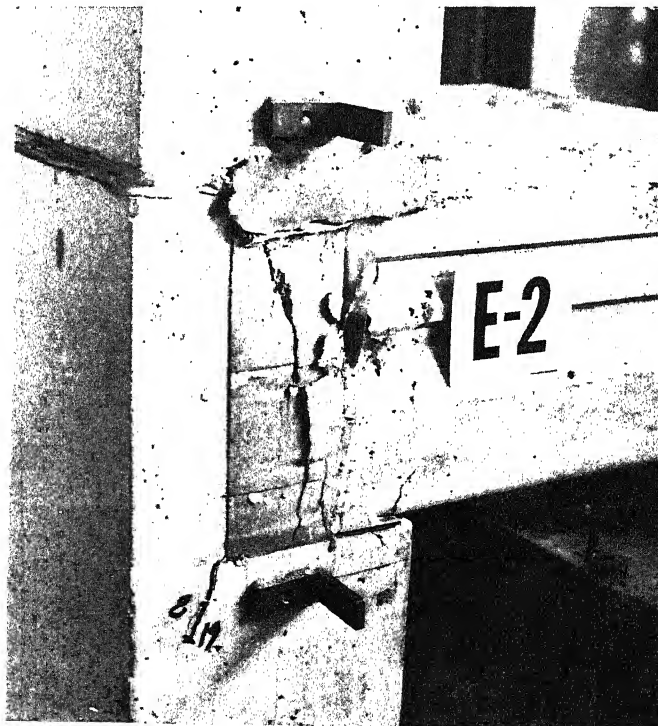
Damage Pattern at Ultimate Load - Exterior Joints
